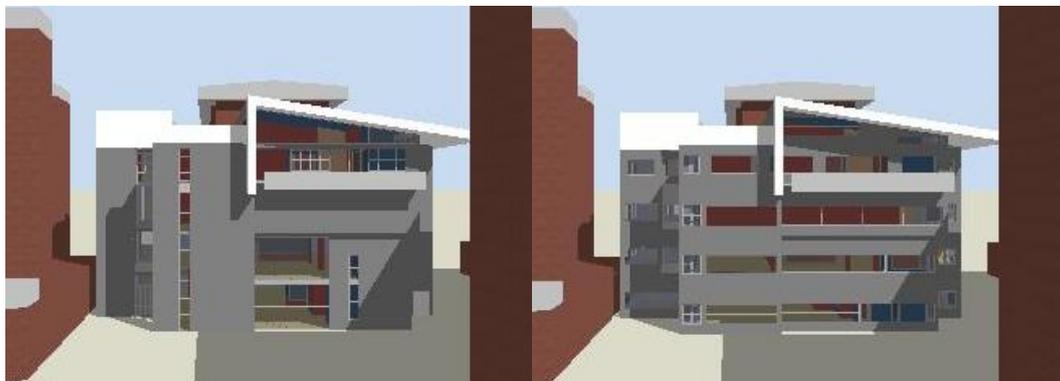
113° Façade glazing representation of the actual building (left) and the notional building (right).
